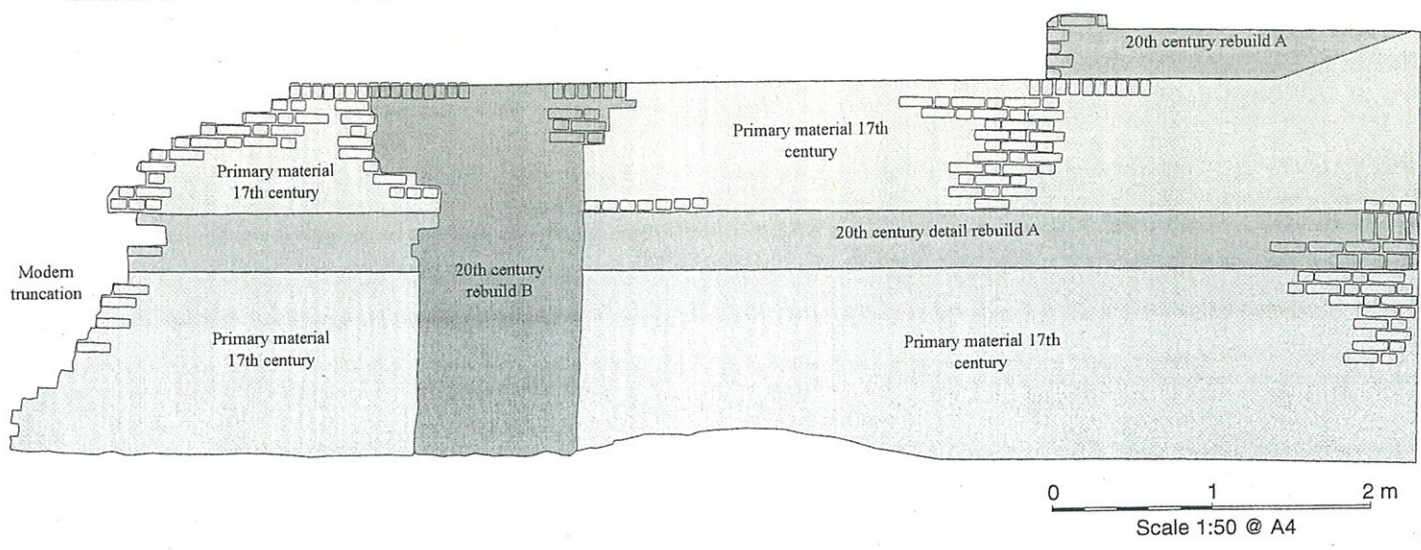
WESTERN ELEVATION OF WALL SHOWING PHASING
